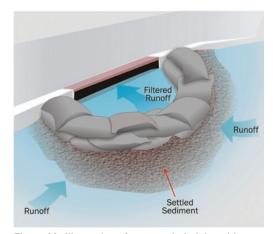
Illustration of a storm drain inlet with rock-filled bags filtering stormwater.
